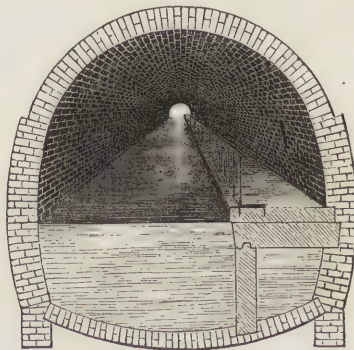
CROSS SECTION OF HARECASTLE TUNNEL
